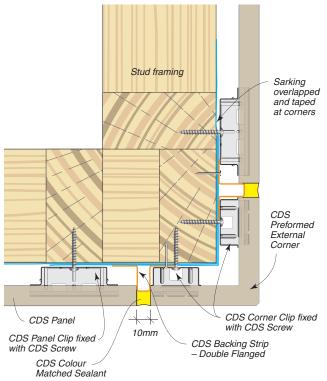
External Corner Detail – With Coloured External Corner Trim – Plan View
